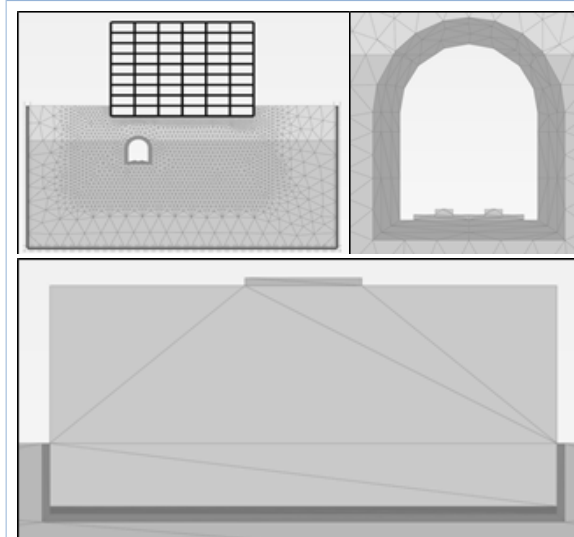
PTunnel section, building floor plan and building cross-section (in metres). Source: Self-elaboration
